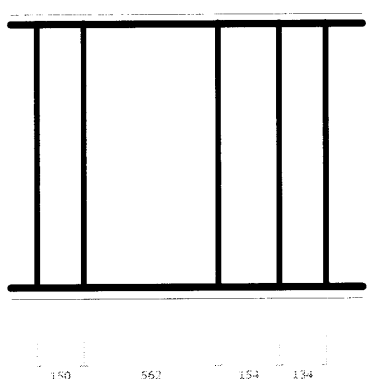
(d) Marking of column reinforcement at ground floor of Architecture building
